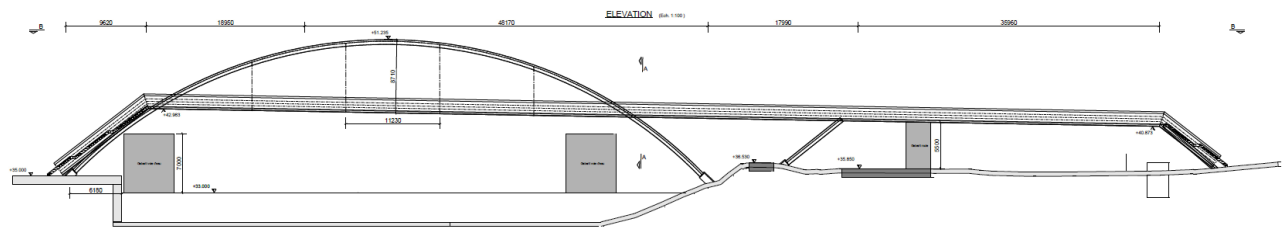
Pre-Design Proposal 2 - Arch Bridge - Steel and Concrete - Bureau Greisch
